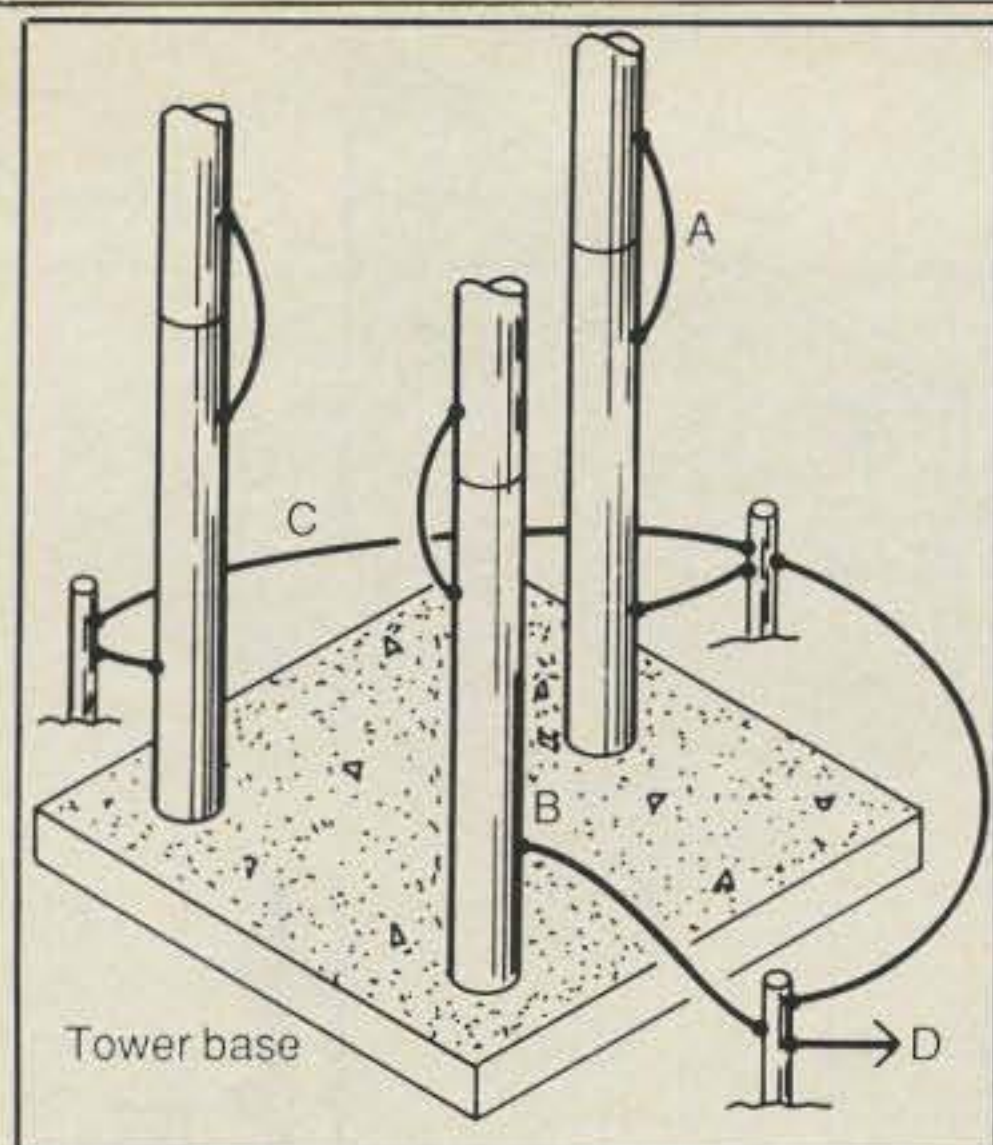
(A) Tower section joints bridged with ground strap or cable. (B) Each leg grounded to own ground rod. (C) Rods tied together with continuous conductor. (D) All tied to service entrance ground.
